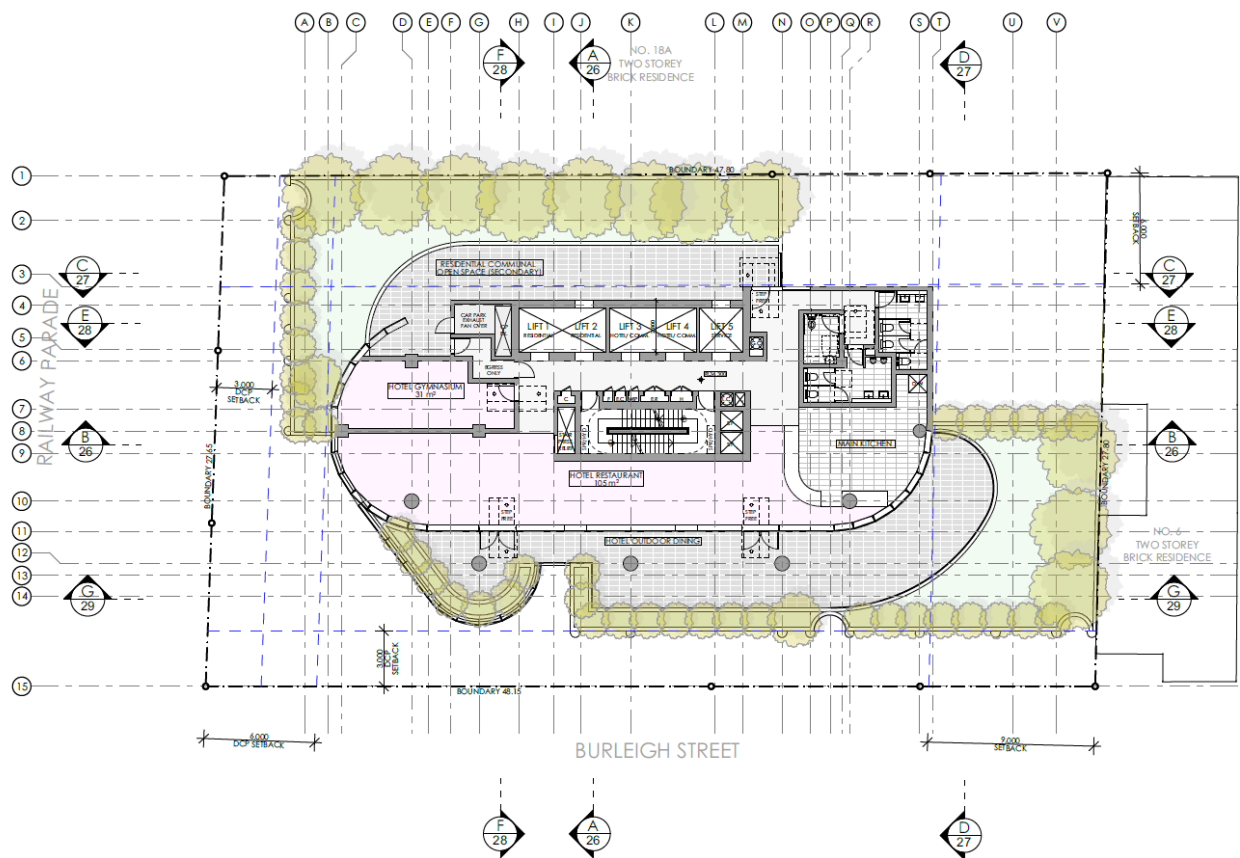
Level 2 Floor Plan prepared by PTI Architecture.
